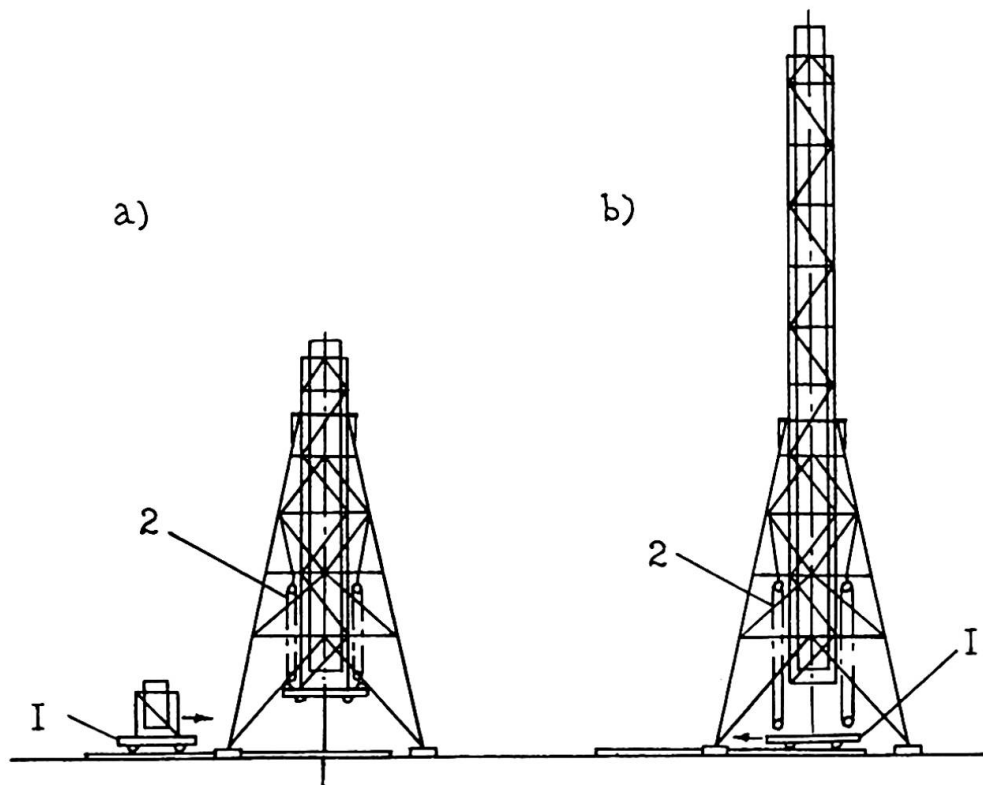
Scheme of erection: a -first step of squeezing out; b - intermediate position; 1 - stand with block on; 2 -tractive tackle block.
